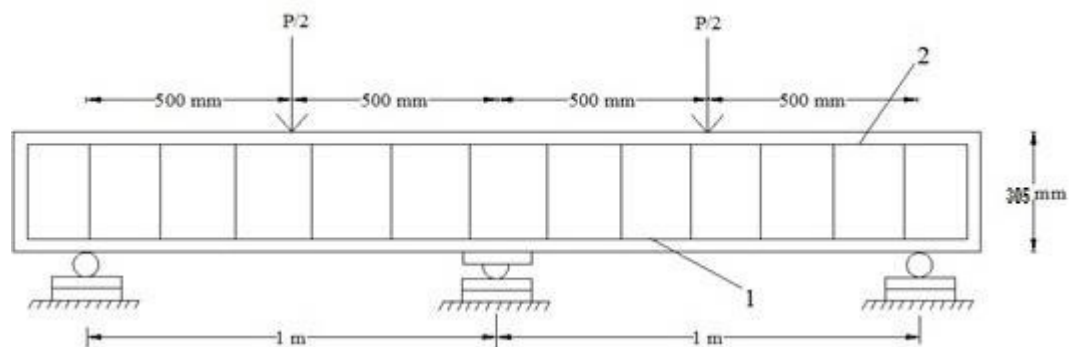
Detailing of reinforcement 1, 2 – top and bottom steel reinforcement
